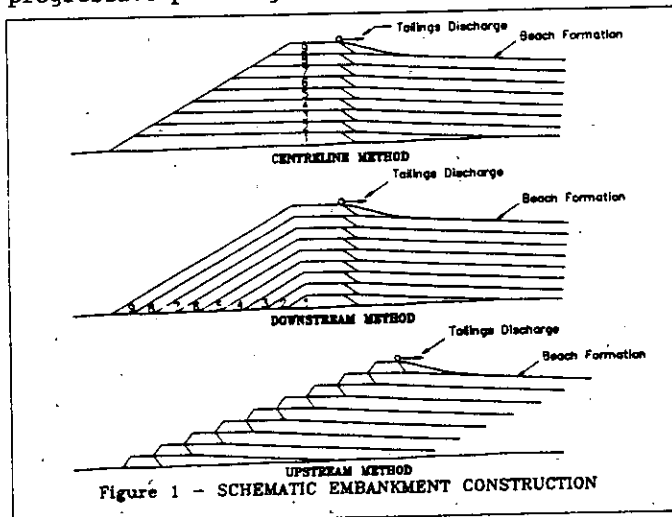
SCHEMATIC EMBANKMENT CONSTRUCTION
